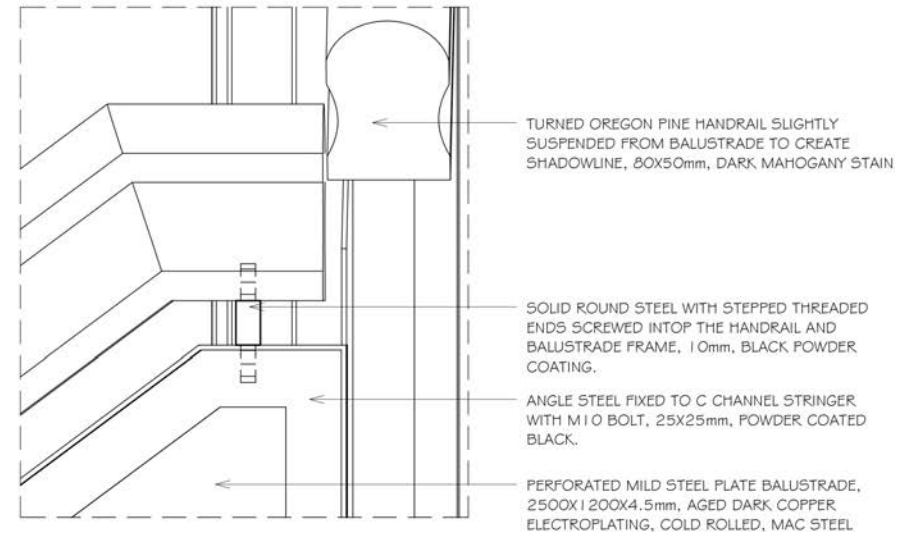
Detail 6 staircase, not to scale (Author 2018)
